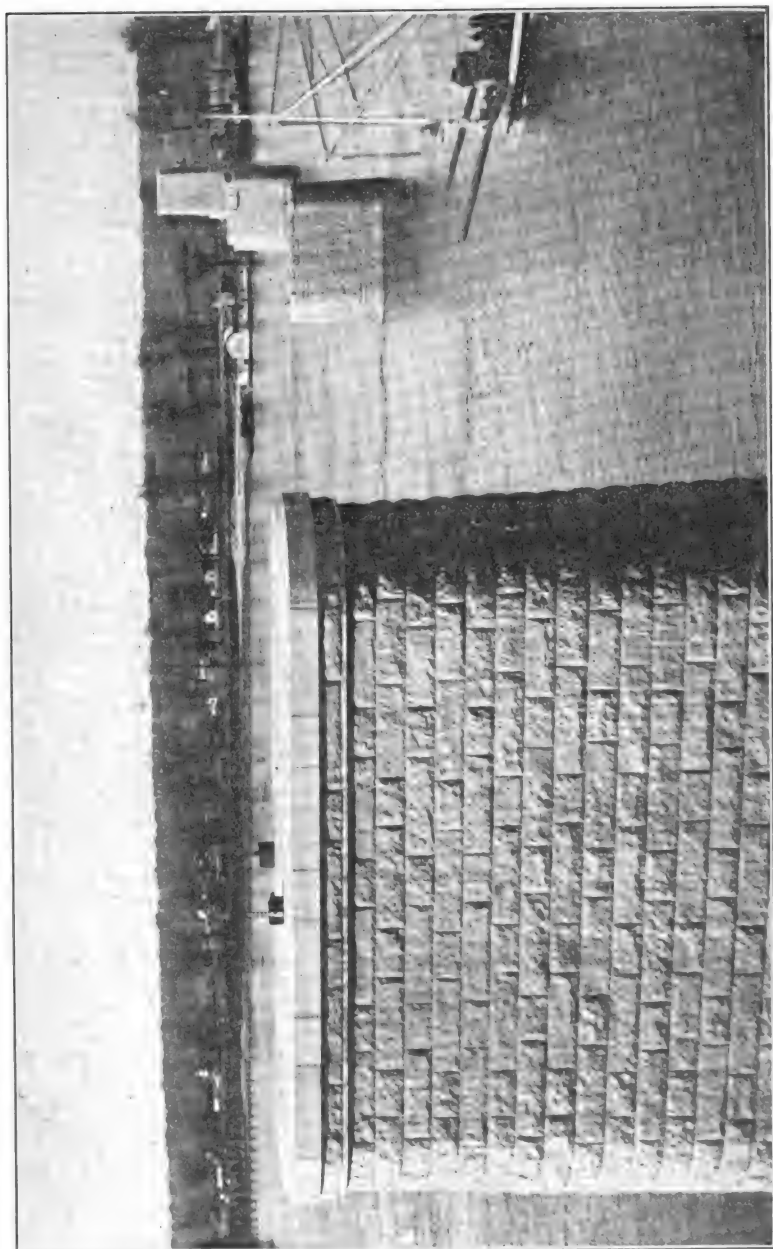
PIERS OF MEMPHIS CANTILEVER.
